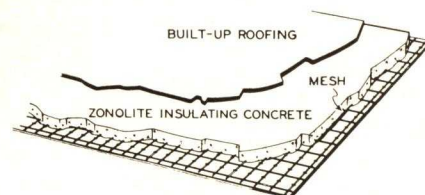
Zonolite Concrete over paper-backed welded wire lath.
